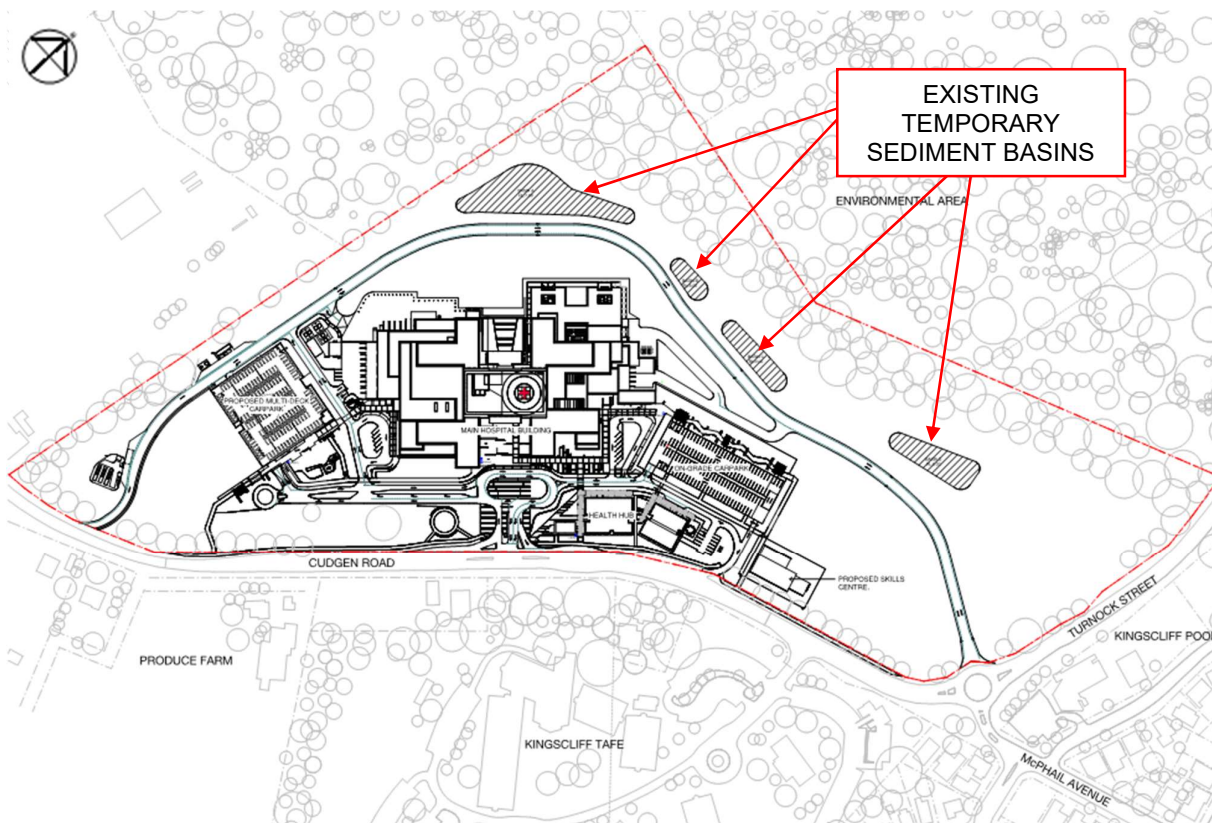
Tweed Valley Hospital, Proposed Site Plan
